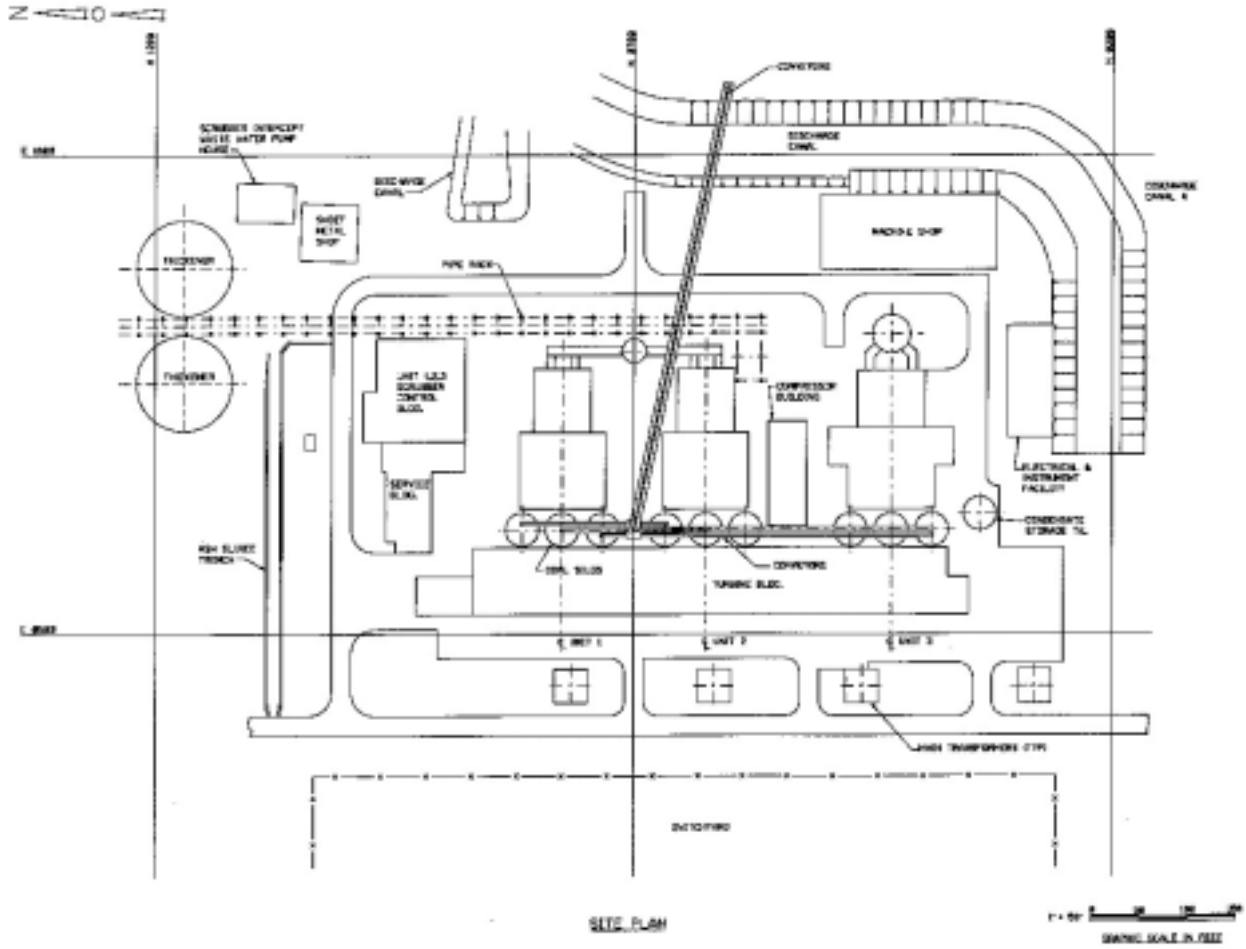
Units 1, 2, and 3 Existing Site Plan Prior to Construction
